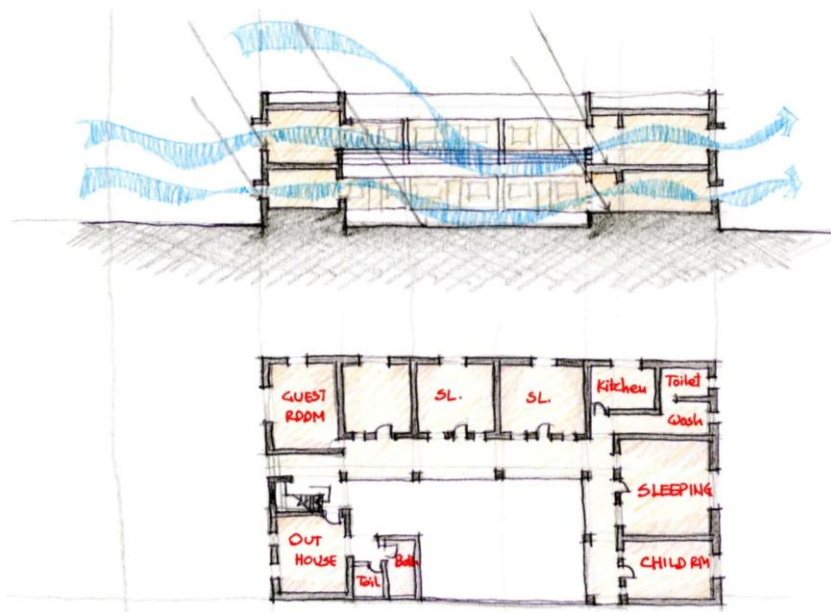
Plan and section of an early 20th century Dhaka house. (source: Islam, 2003)
